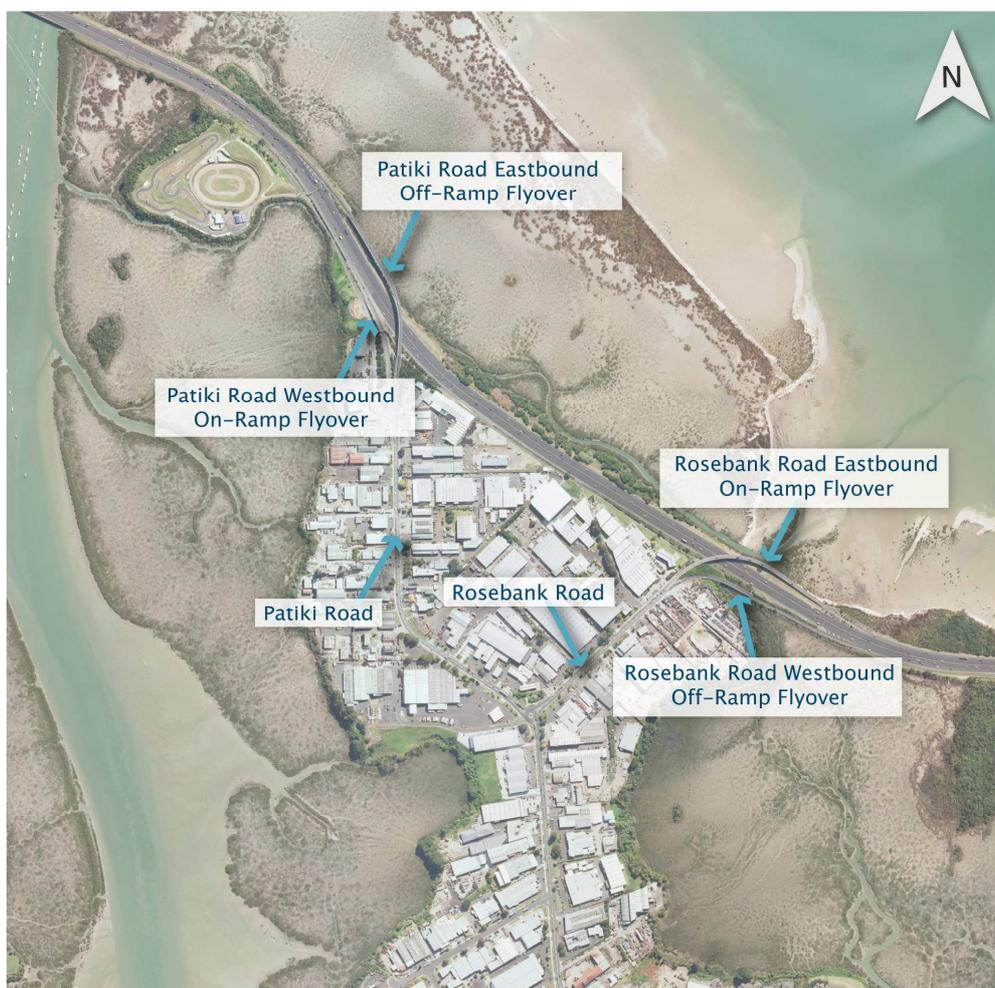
Existing Ramp Arrangements at Patiki Road and Rosebank Road
